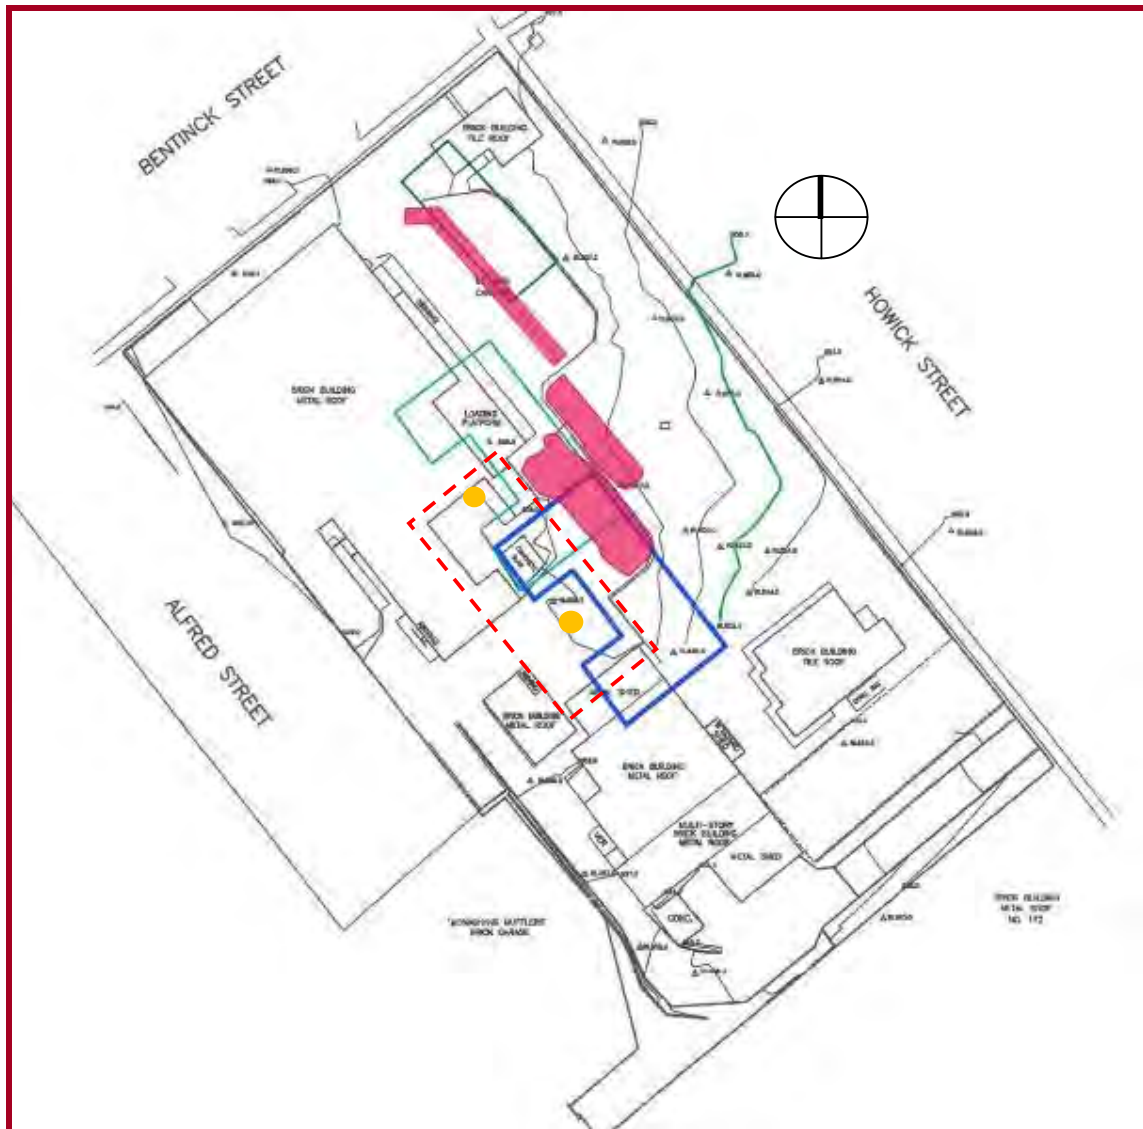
Proposed position of the test trench is shown as red dashed rectangle on a plan of the current site. The potential position(s) of the convict hospital, as discussed in the Assessment report, are outlined in light and dark blue and green. The potential site(s) of the well is shown as an orange circle. RL 655 contour is outlined in green.
